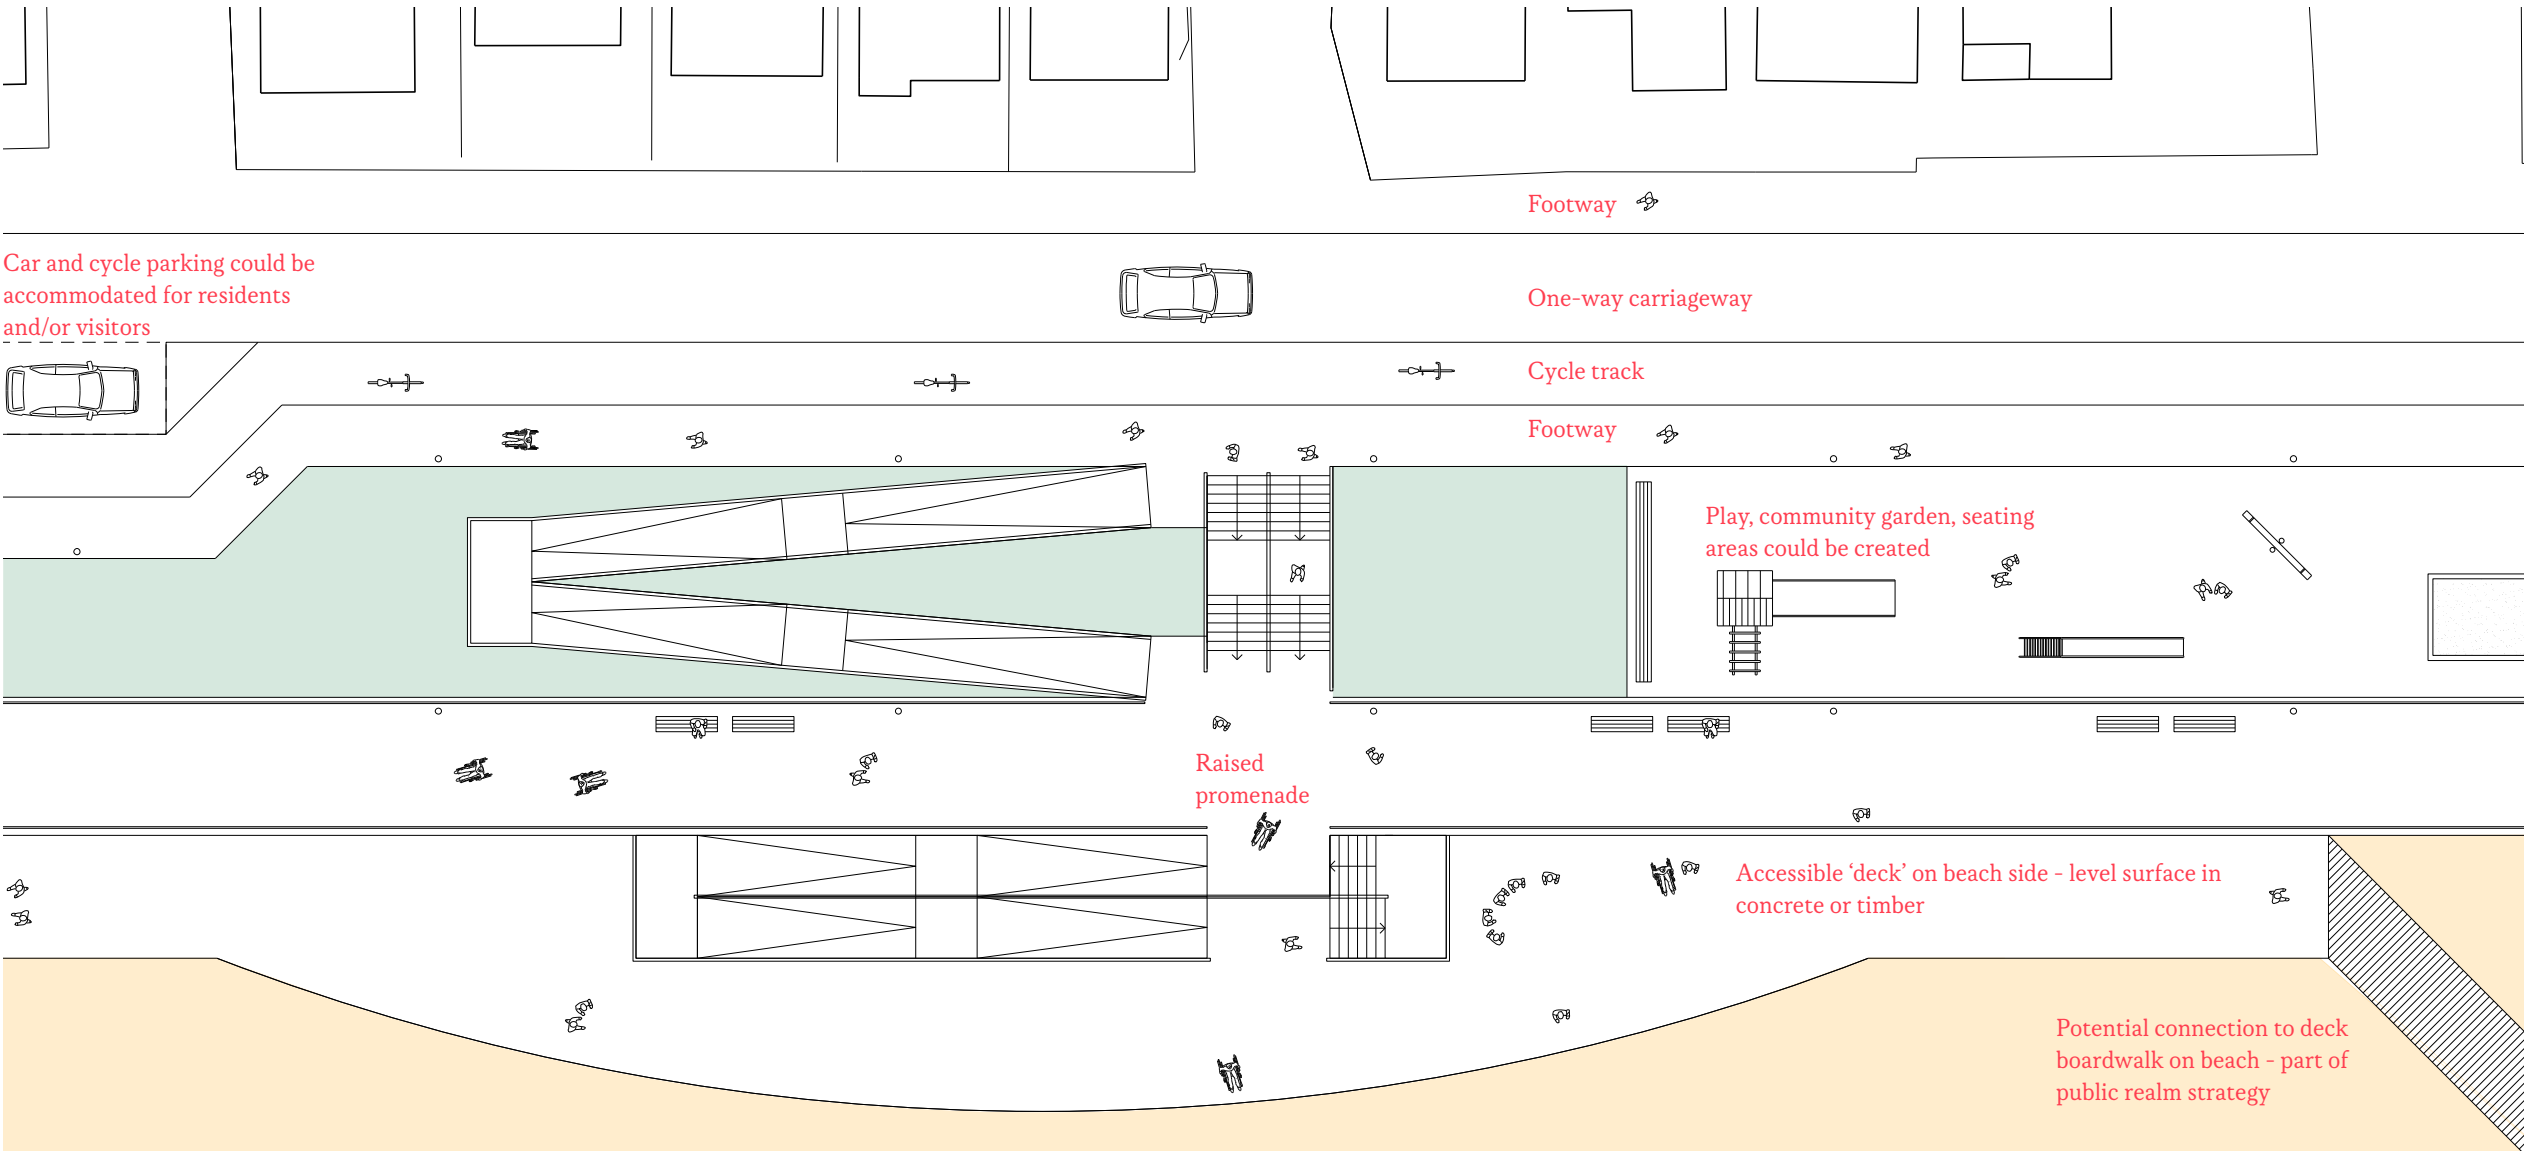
Option B - indicative plan of proposed new sea wall at Brooklands
